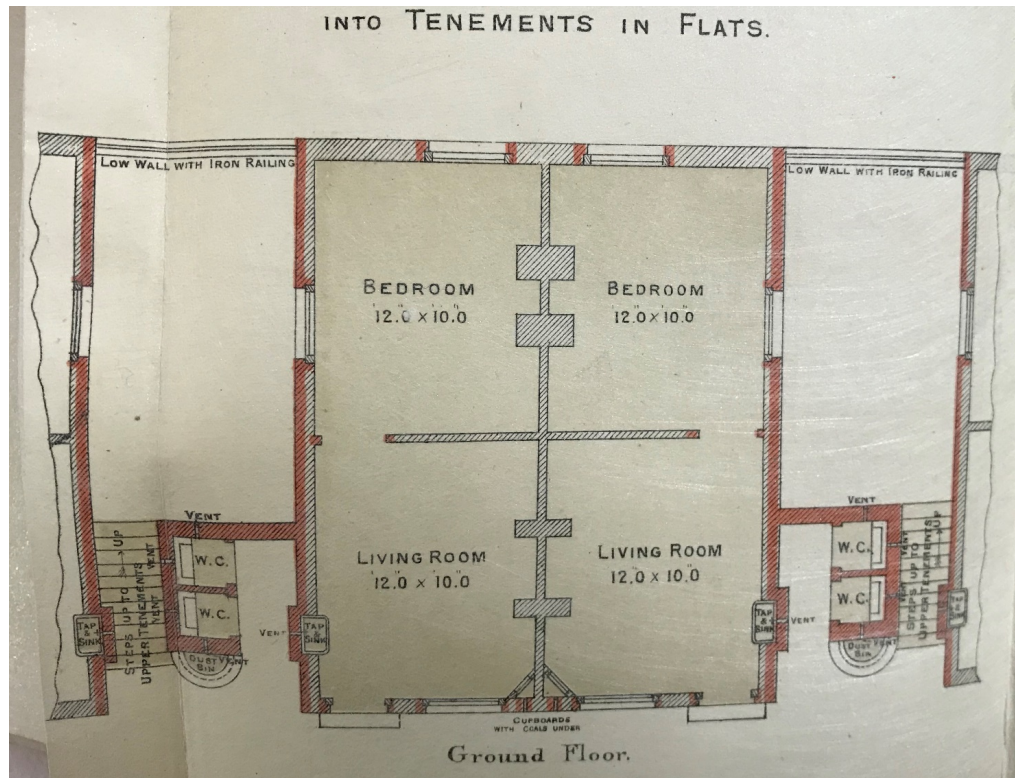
Plan of a court house intended to be converted into a tenement in 1884 in Liverpool
